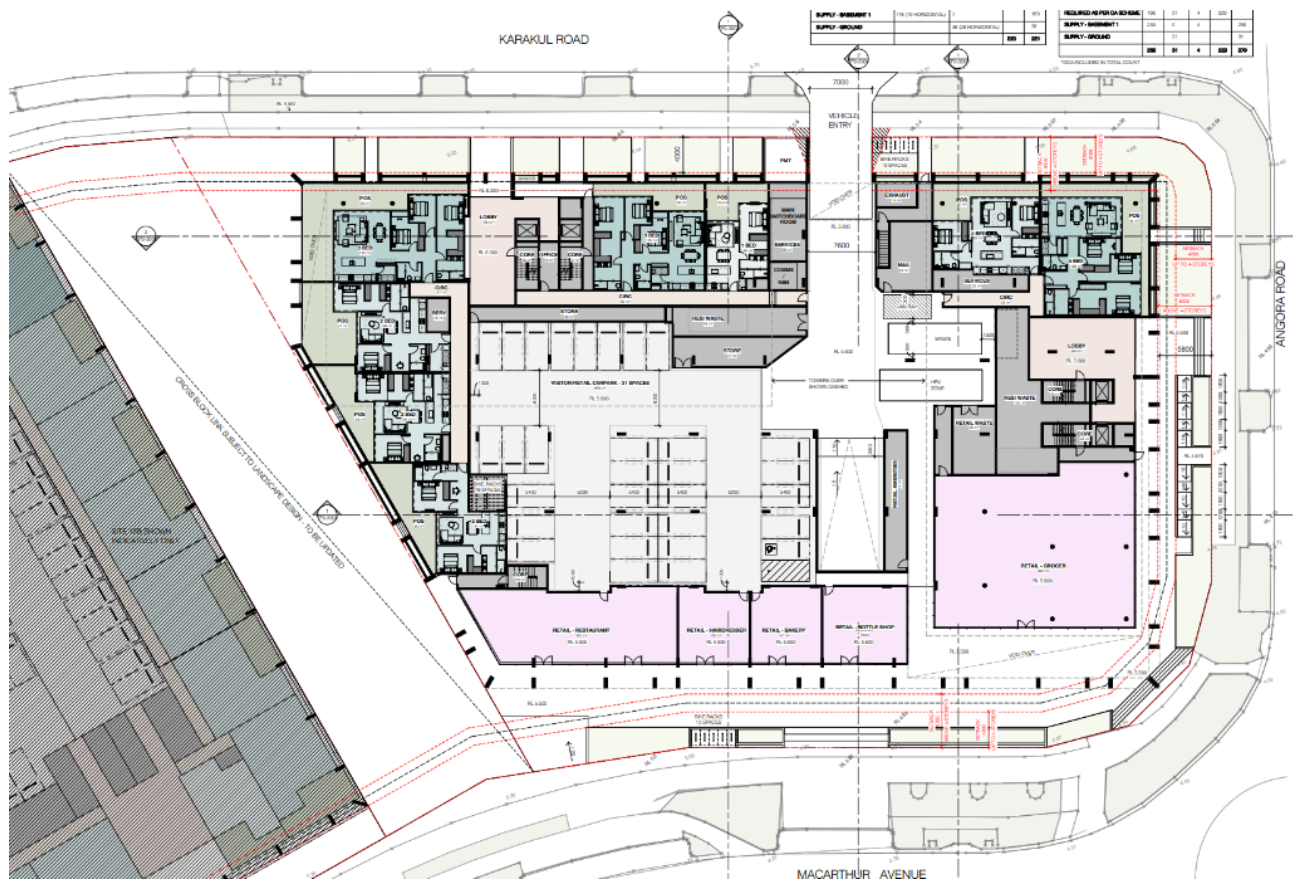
Extract from proposed development plan at ground level Site 18A (Carr 24047-TP2-1002).
